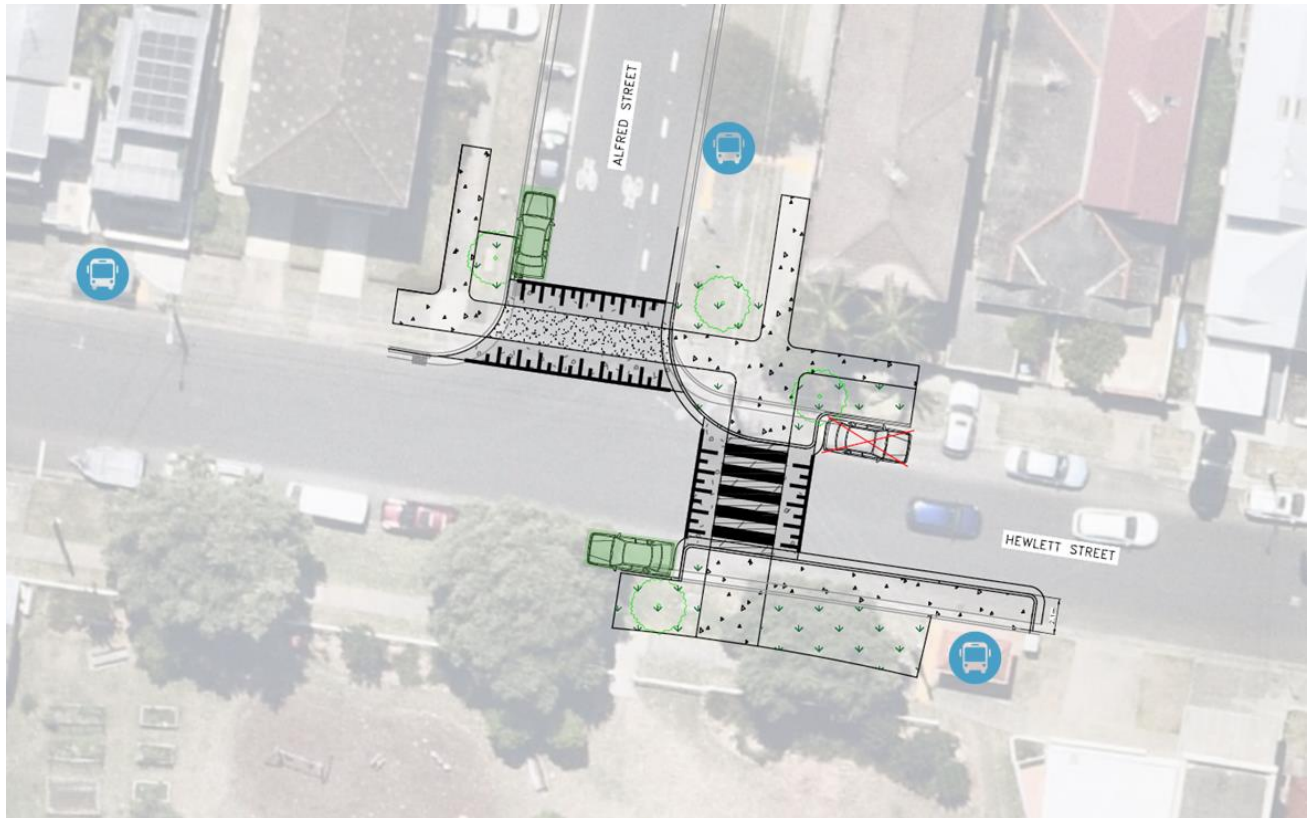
Pedestrian amenity works in Alfred Street and Hewlett Street.
